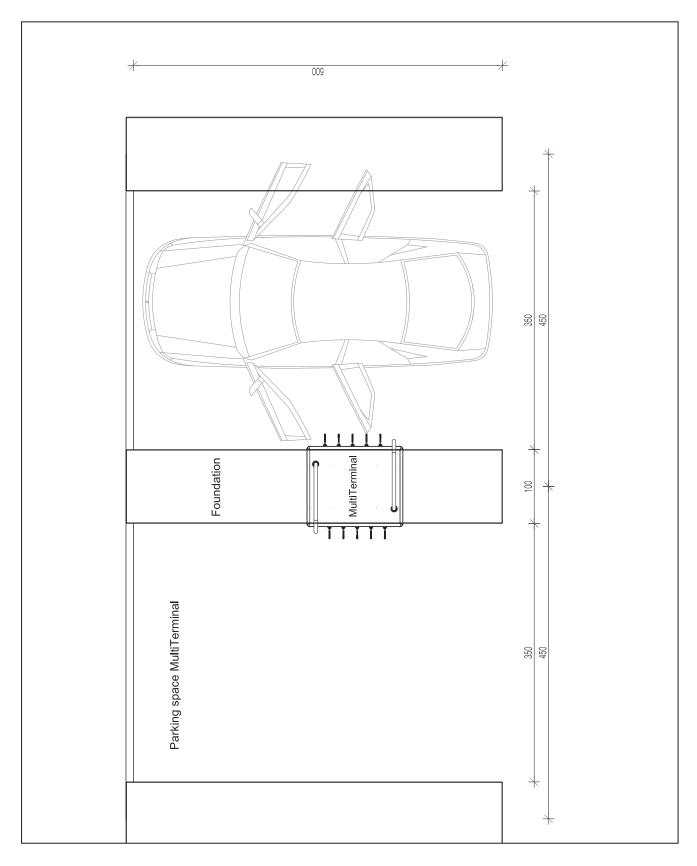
3 Dimensions for parking space clearance (general example)
